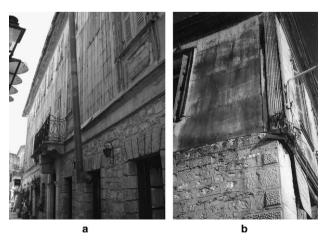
Protection of timber elements: (a) by timber planks; (b) by metal sheets.
